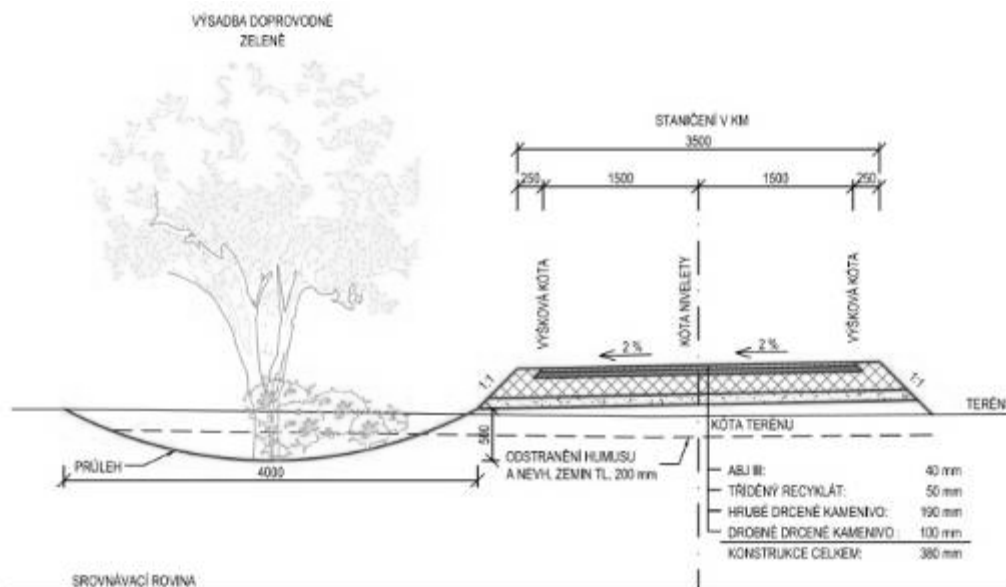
Typical cross section by rural road, revitalized drainage canal with vegetation. (Ing. P. Pelikán)
